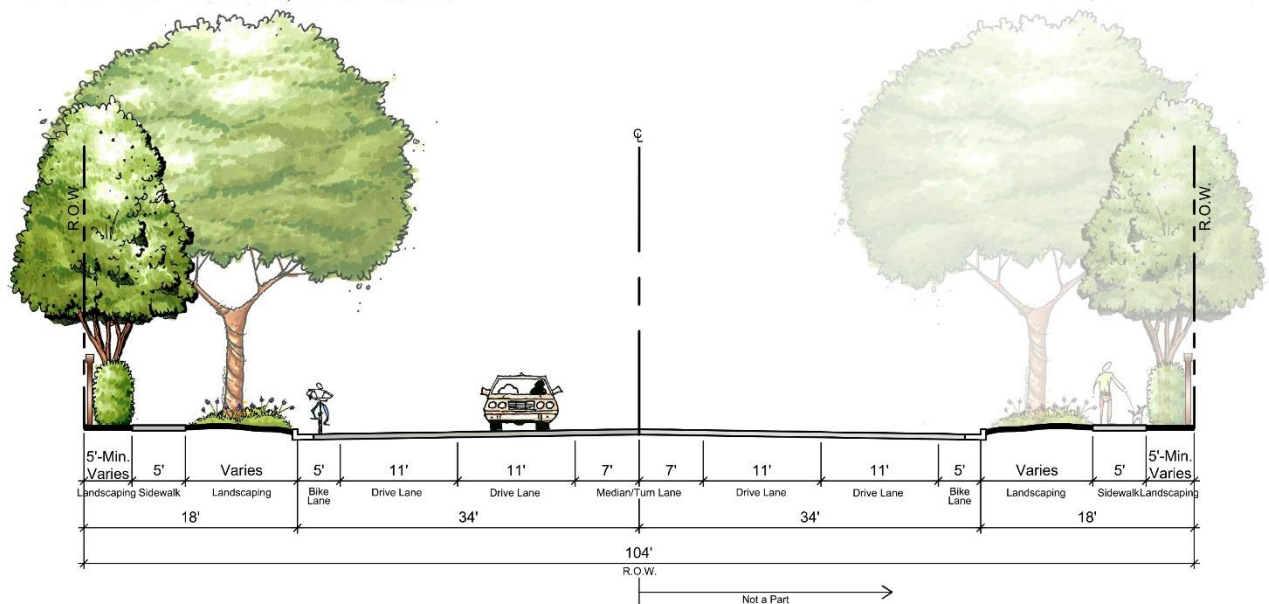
104' South Main Street Section South of the East/West Collector
